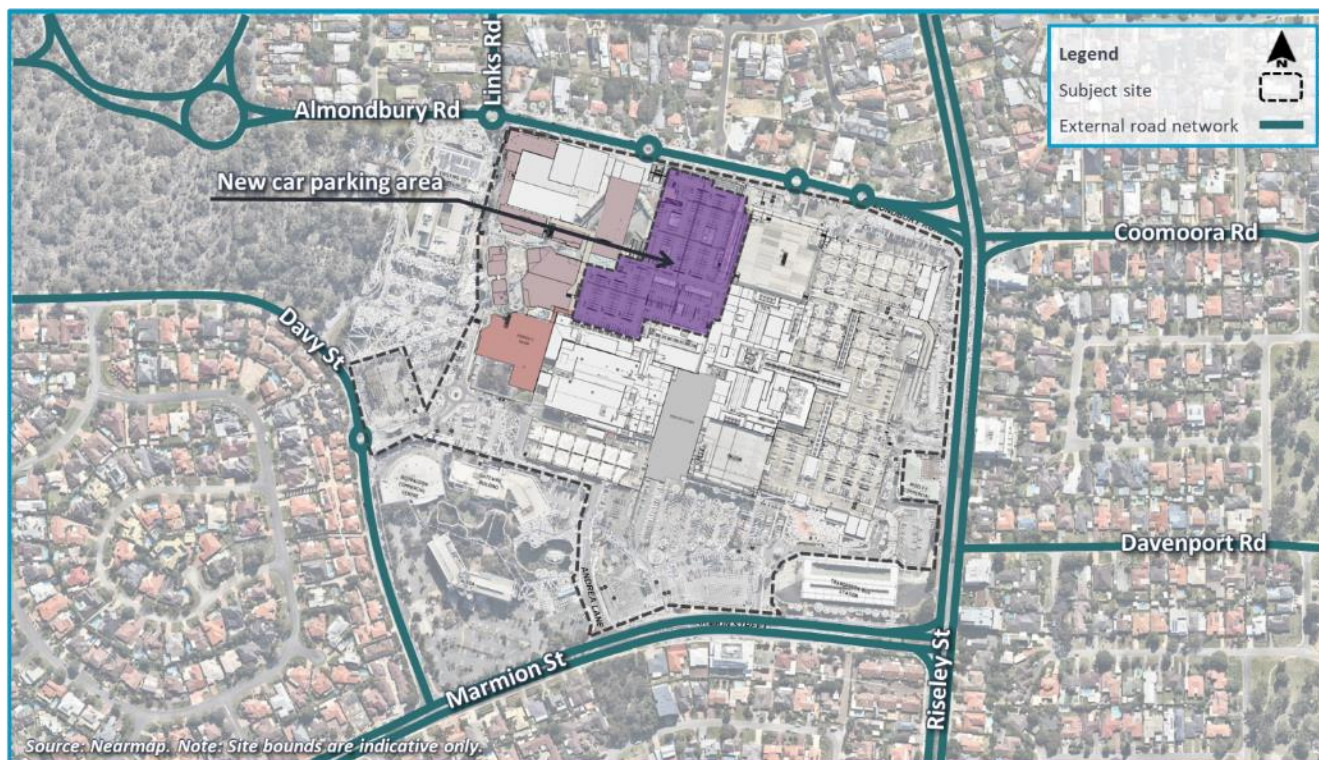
New Rooftop Car Parking Areas (Stage 1)
